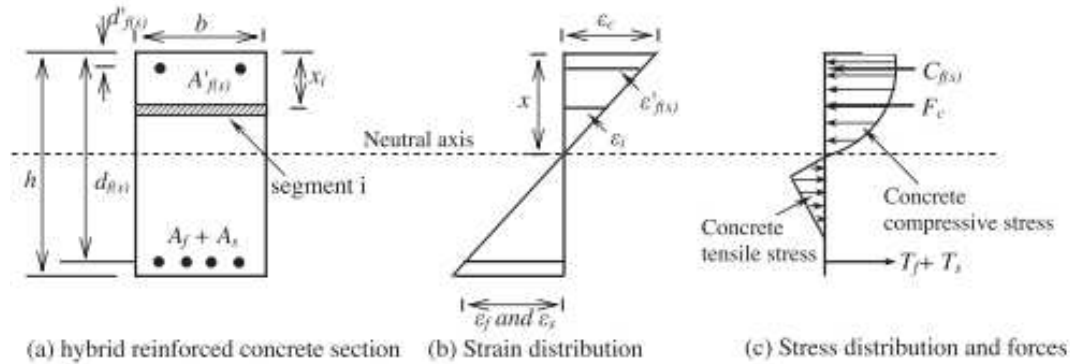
Strains, stresses, and forces of a hybrid FRP/steel reinforced concrete section [23]
